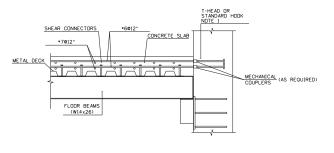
H.5-5 (Sheet 3 of 3) [Wall 11 at Main Steamline Anchor Section A-A]
